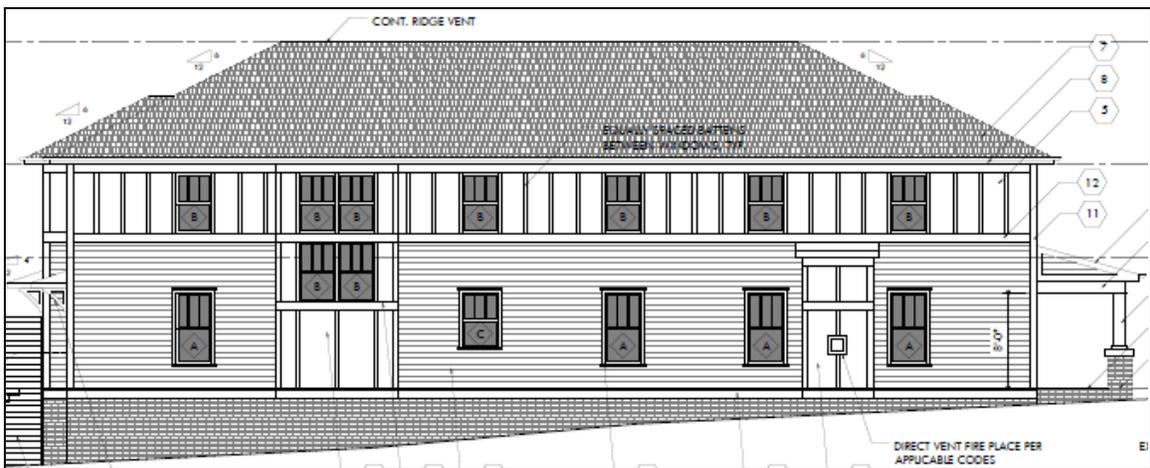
The side façade of the proposed infill, which has a wall of over eighty feet (80') long.
